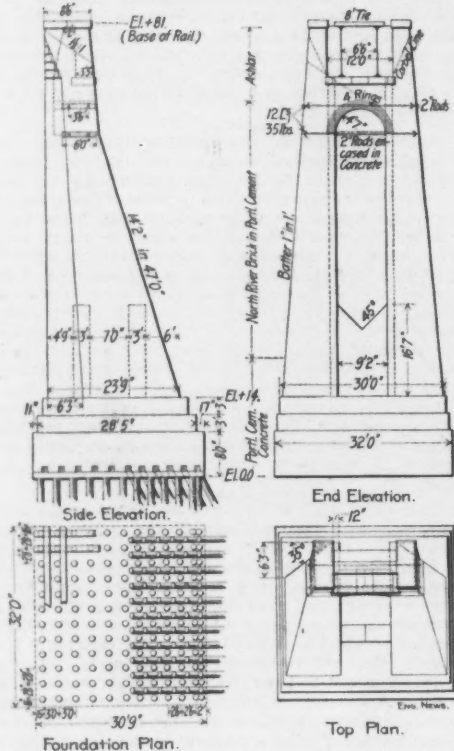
General Plans of Special Pier Construction, Manhasset Viaduct, Long Island Ry.
